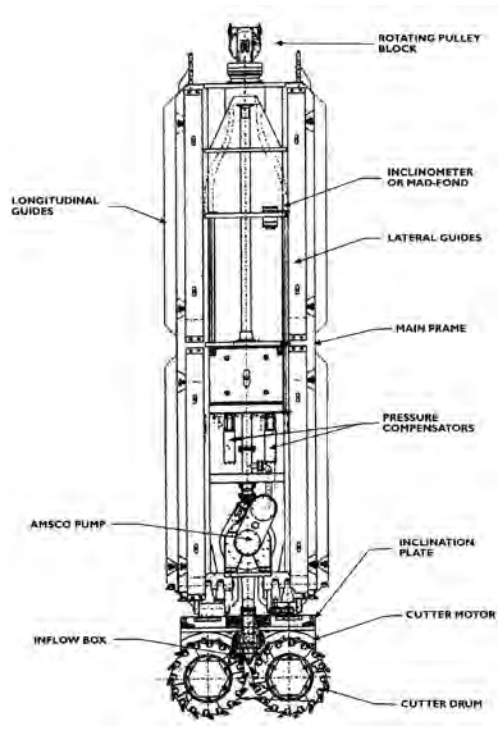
Excavation of a Diaphragm Wall or Barrette Using a Hydromill
